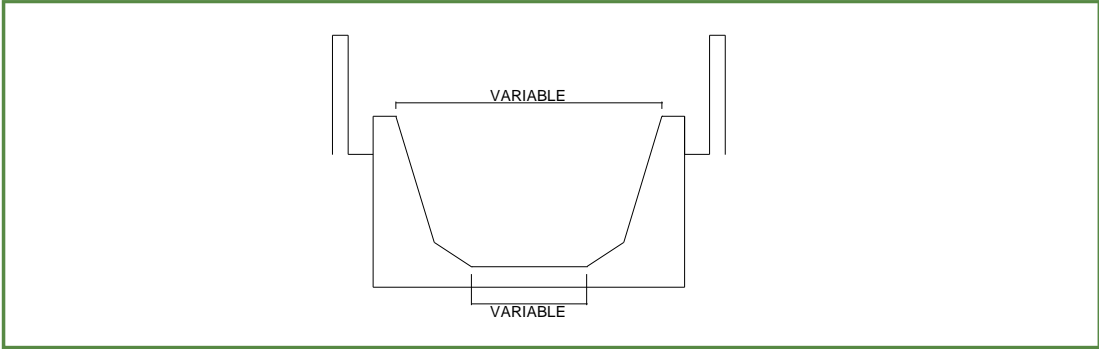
DETAIL OF KALI SURABAYA (MENTENG AREA 1)
